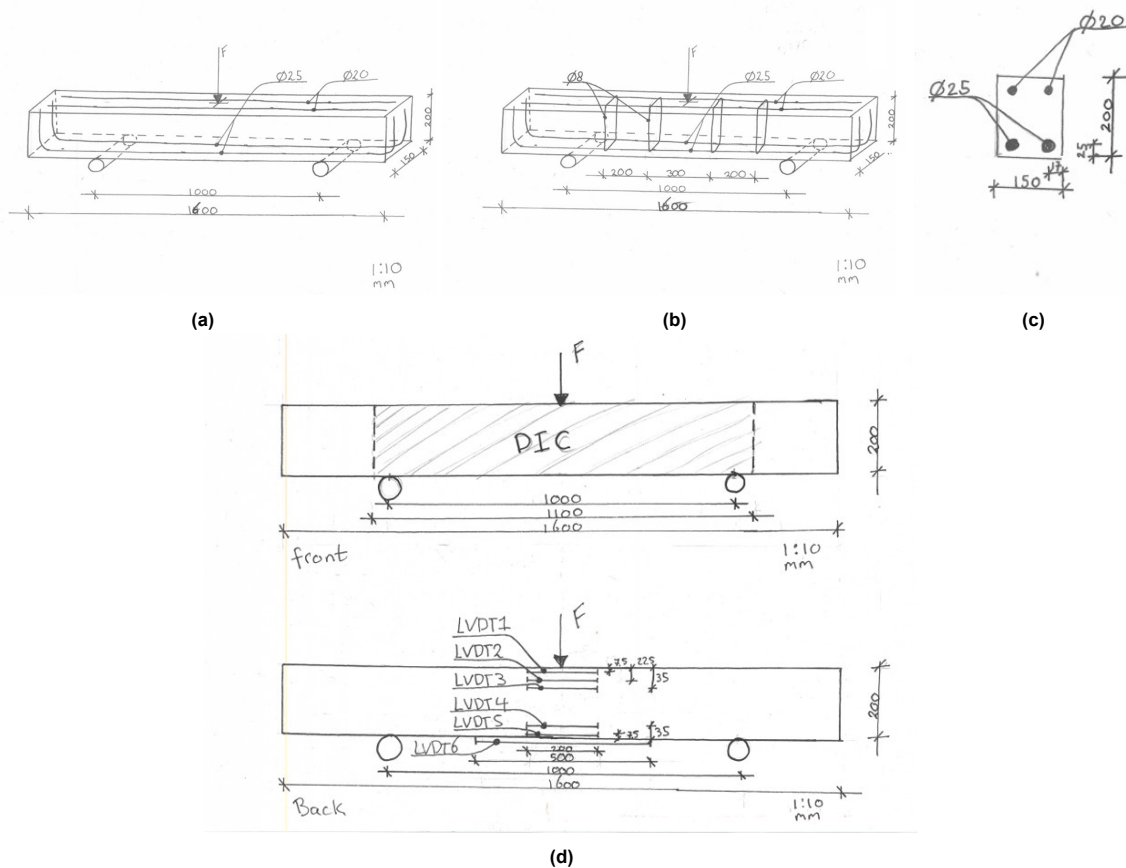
Drawings of the specimens for the shear test. a) Shear beam without stirrups, b) shear beam with stirrups, c) cross-section of the beam and d) front and back of the specimens with measurement techniques, DIC, and LVDT layout.
